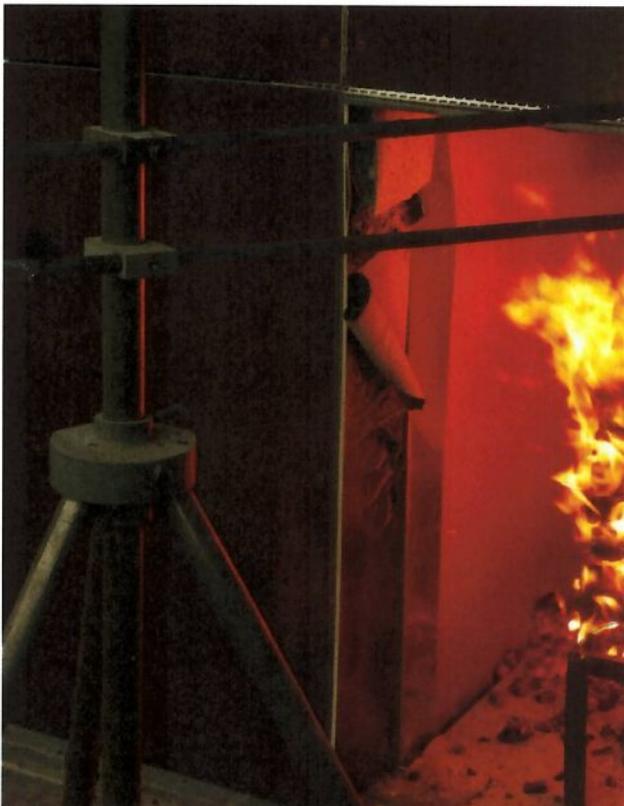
(P1110038): Test specimen during the fire test — Test duration 16 minutes (flaking on the soffit panel cladding board)
